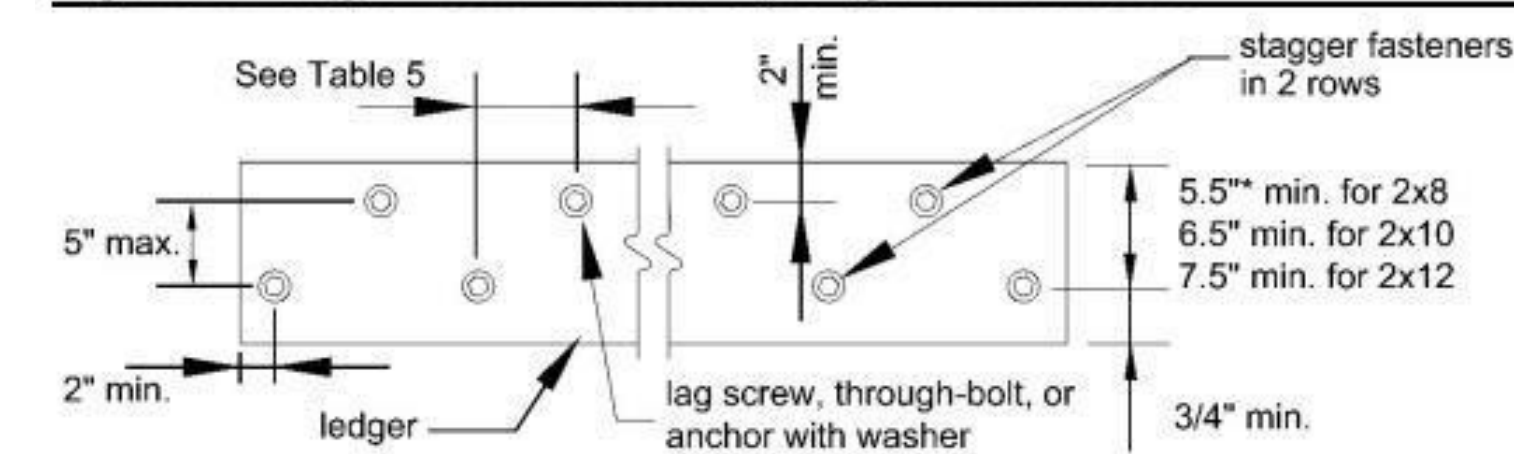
General Attachment of Ledger Board to Band Joist or Rim Joist.
